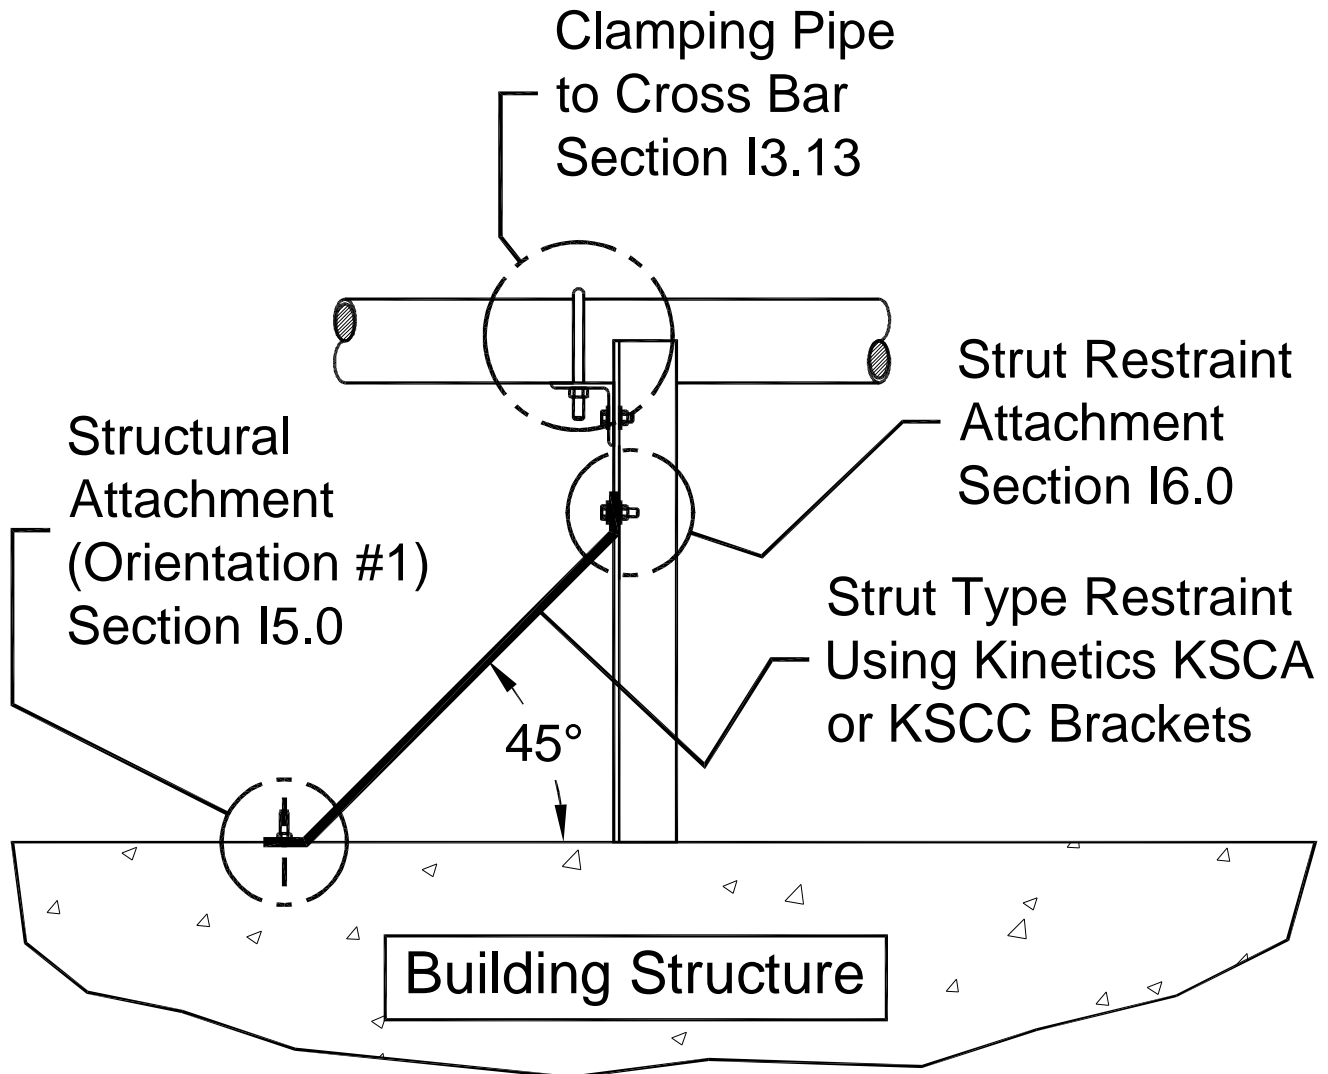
; Longitudinal (L) Strut Type Restraint Schematic for Floor/Roof Mounted Pipe – Strut Attached to the Floor Stand or Support at a 45° Angle
